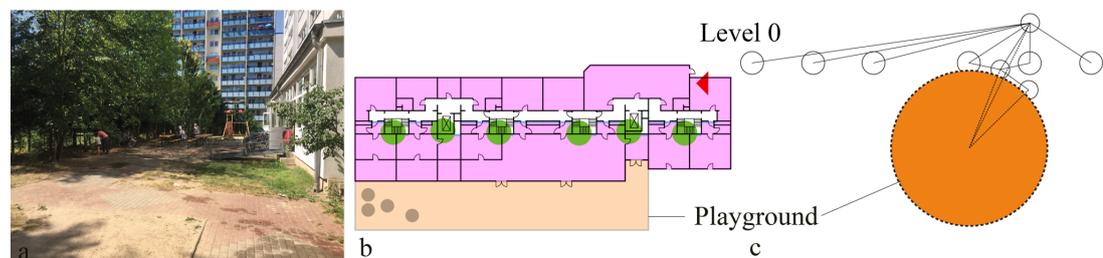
External PA space example (a) photo; (b) floor plan; (c) spatial analysis visualisation
